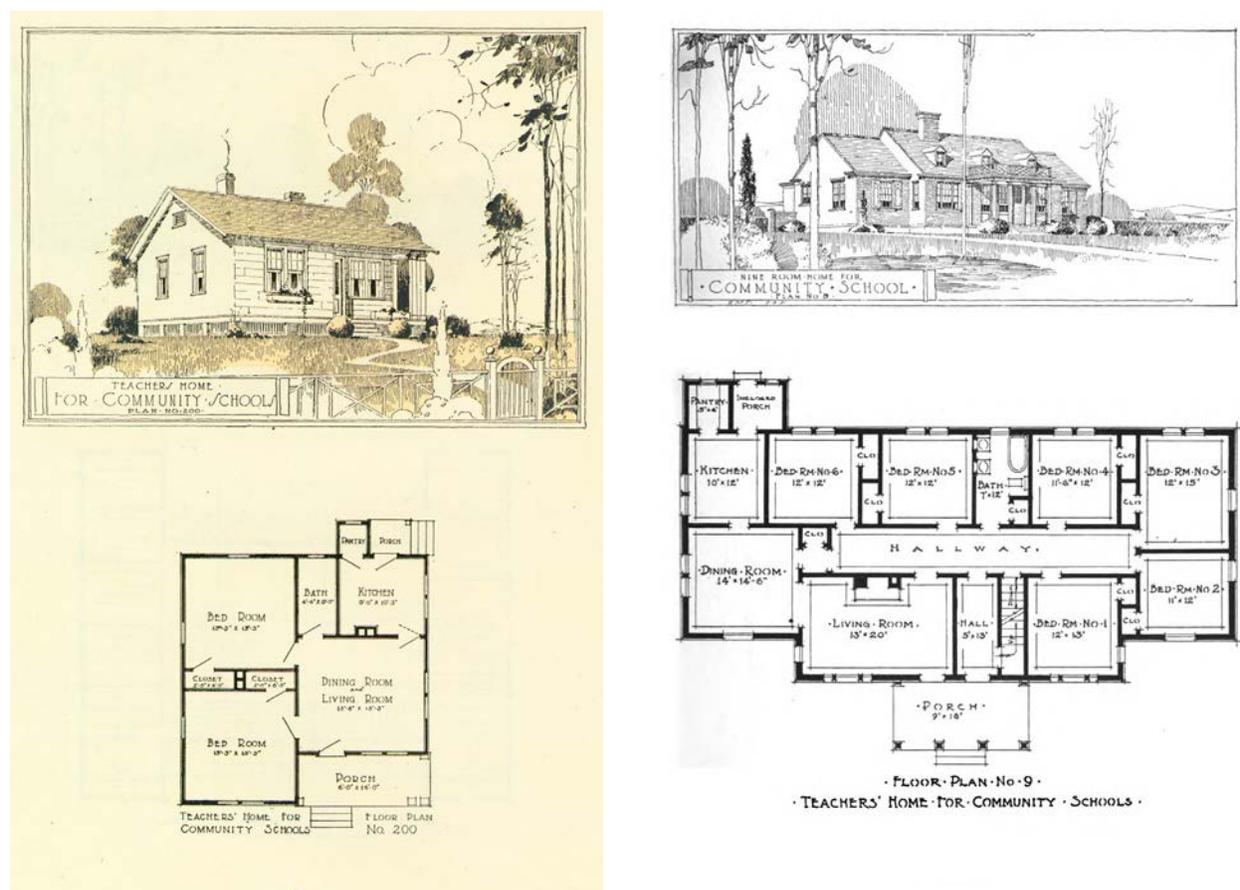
Plan 200 (left) from the 1924 edition of *Community School Plans*; Plan 9 (right) from 1931.
